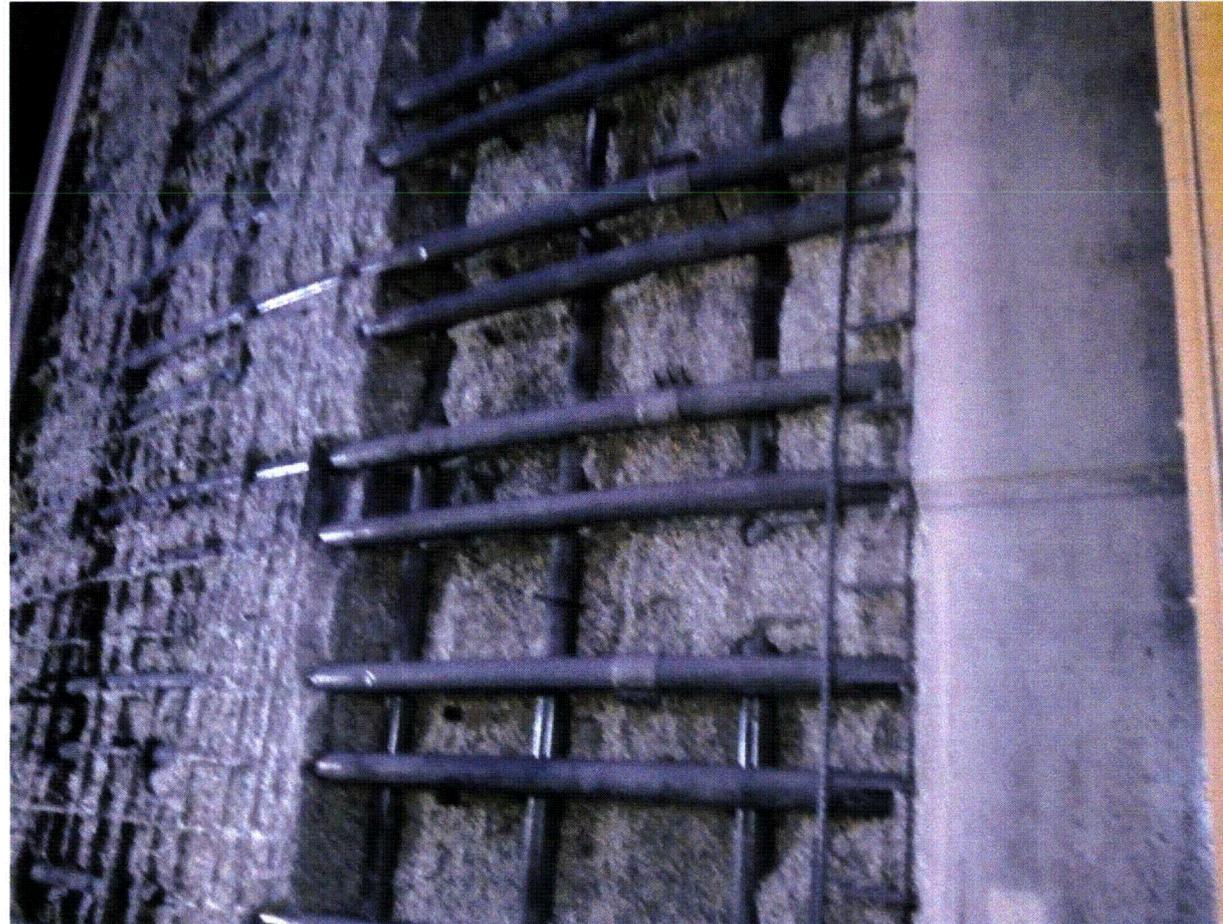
RIGID/FLEXIBLE VERTICAL TENDON LAYOUT
